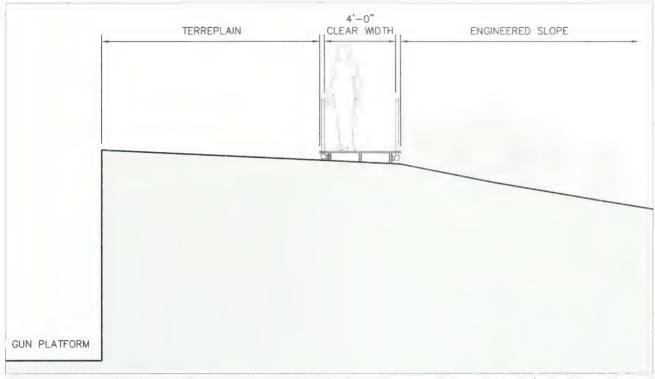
Conceptual section through Nine Gun Battery and boardwalk. In order to provide greater visitor safety and protect the historic earthwork, a boardwalk should be installed for visitor access across the terreplein (Olmsted Center, 2009).
